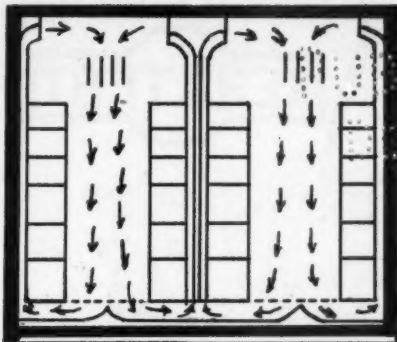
Section BB showing cork envelope floor and path of circulation. Six inches of Palco wool used in walls. Air channels in floor and walls are ribbed with 16 inch spacing. Exit air passes through controlled grills. Lockers are set on metal grills.
